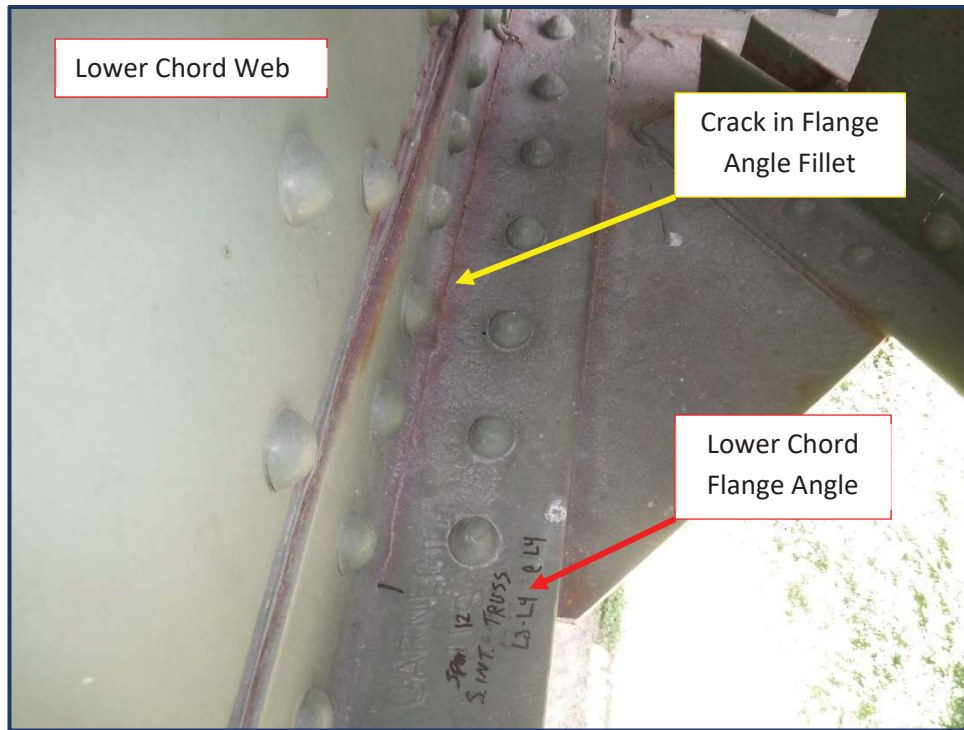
Cracks in Fillet of Lower Chord Flange Angles
